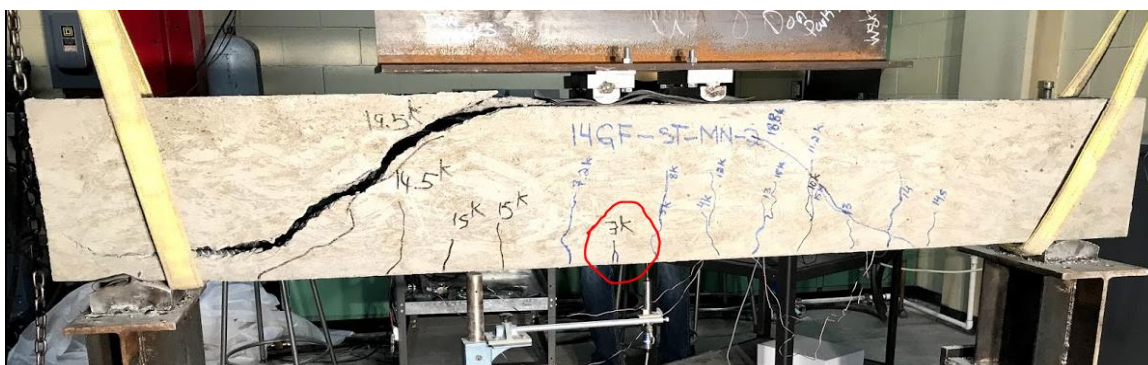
Hybrid GFRP with steel reinforced-only beam after failure
